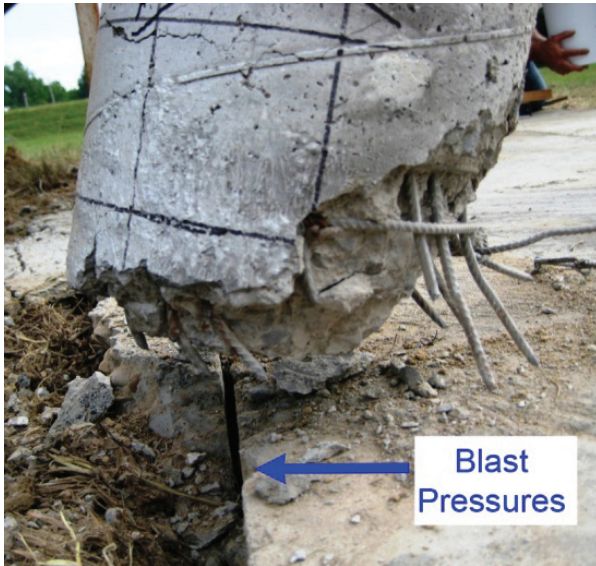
Fracture Surface of Footing at Column RC1 (Test 1)
